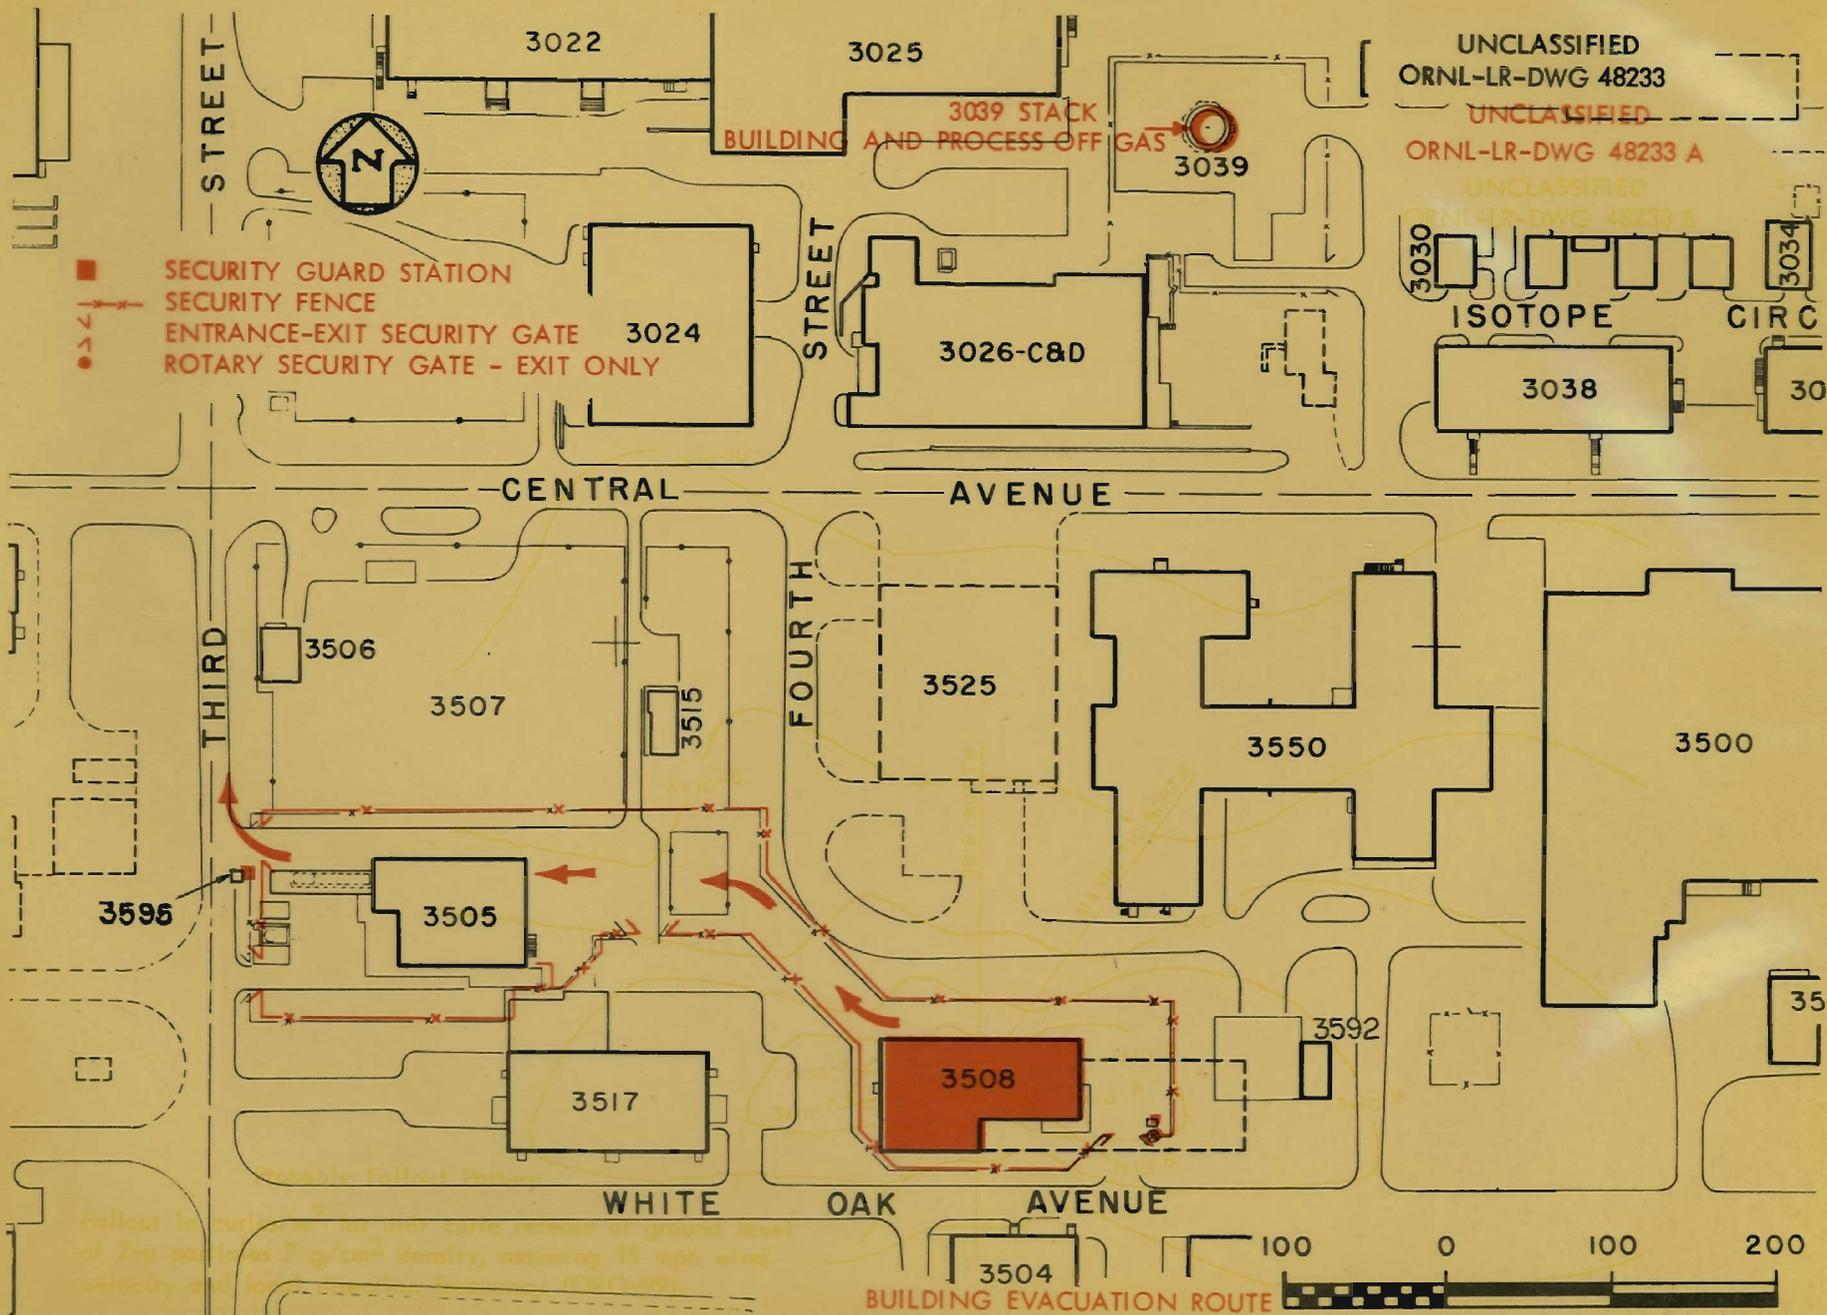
BUILDING 3508 AREA PLOT PLAN
